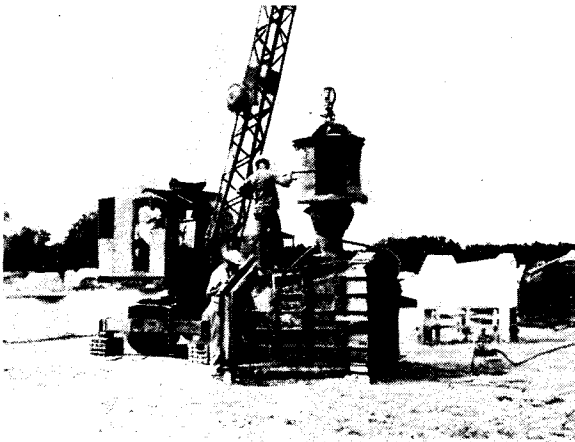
Precast concrete transitions in various stages of completion. P-707-729-1763
